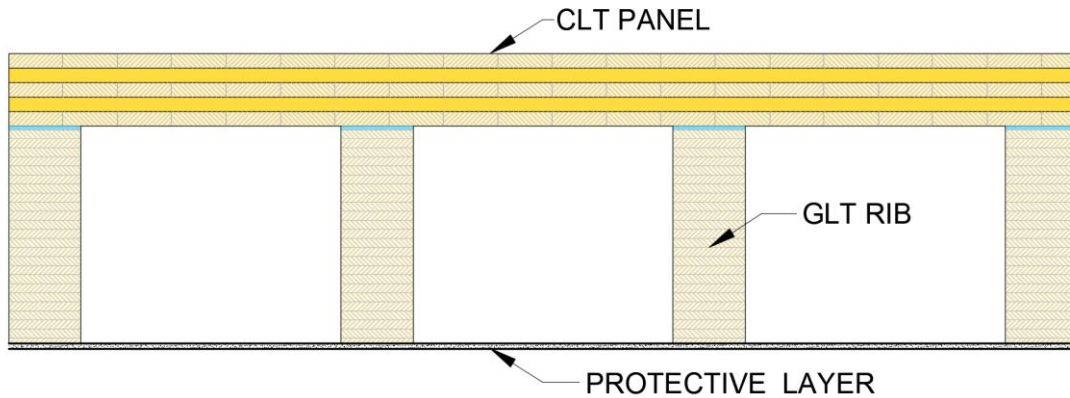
g: CLT Rib Panel with straight protective layer to the soffit of the ribs, creating voids
